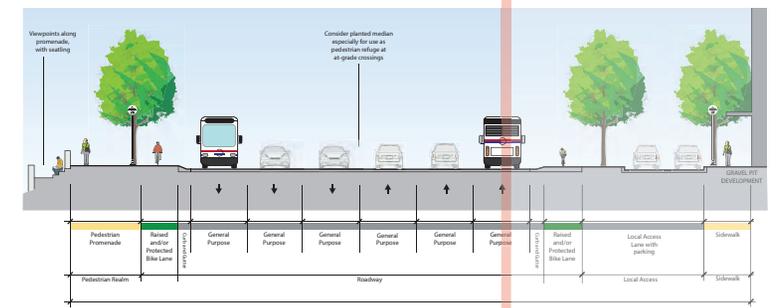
Illustrative street cross section concept for Wasatch Boulevard in the Gravel Pit area.
